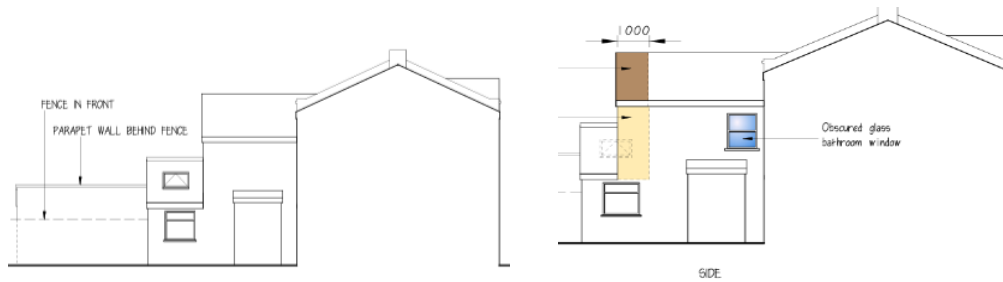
Existing side plan (left) and proposed side elevation plan (right)
